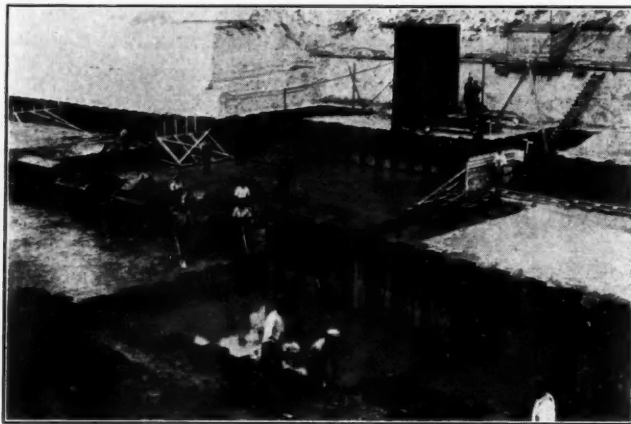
Foundations of the lock at Denderbelle, Belgium.
